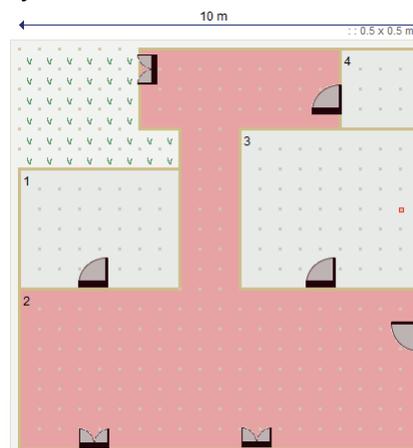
Floor plan layout for ID 4 as depicted in FLORETO.
